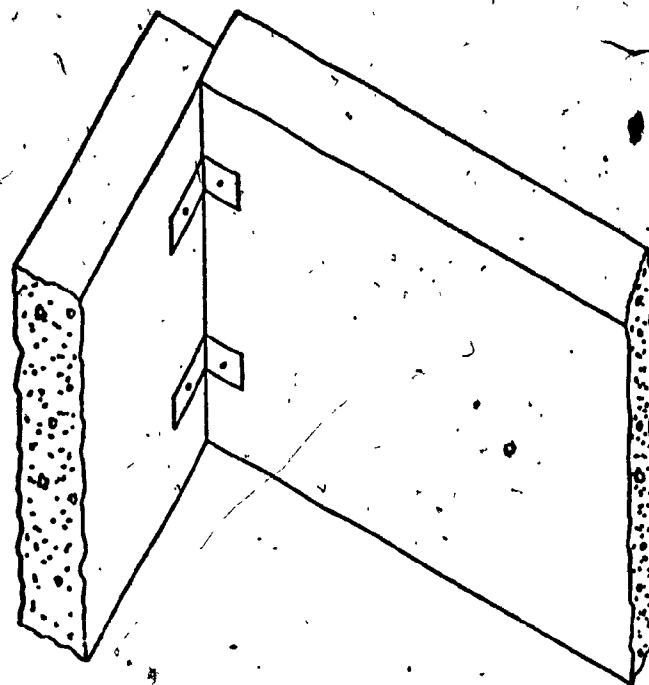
Typical "DRY" Vertical Wall-to-Wall Connection
